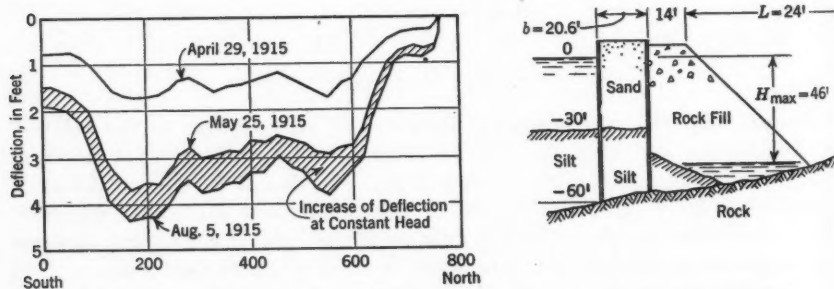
DEFLECTION OF COFFERDAM CREST FOR THE LAND SECTION OF HUDSON RIVER PIERS ($H = 46$ Ft)
